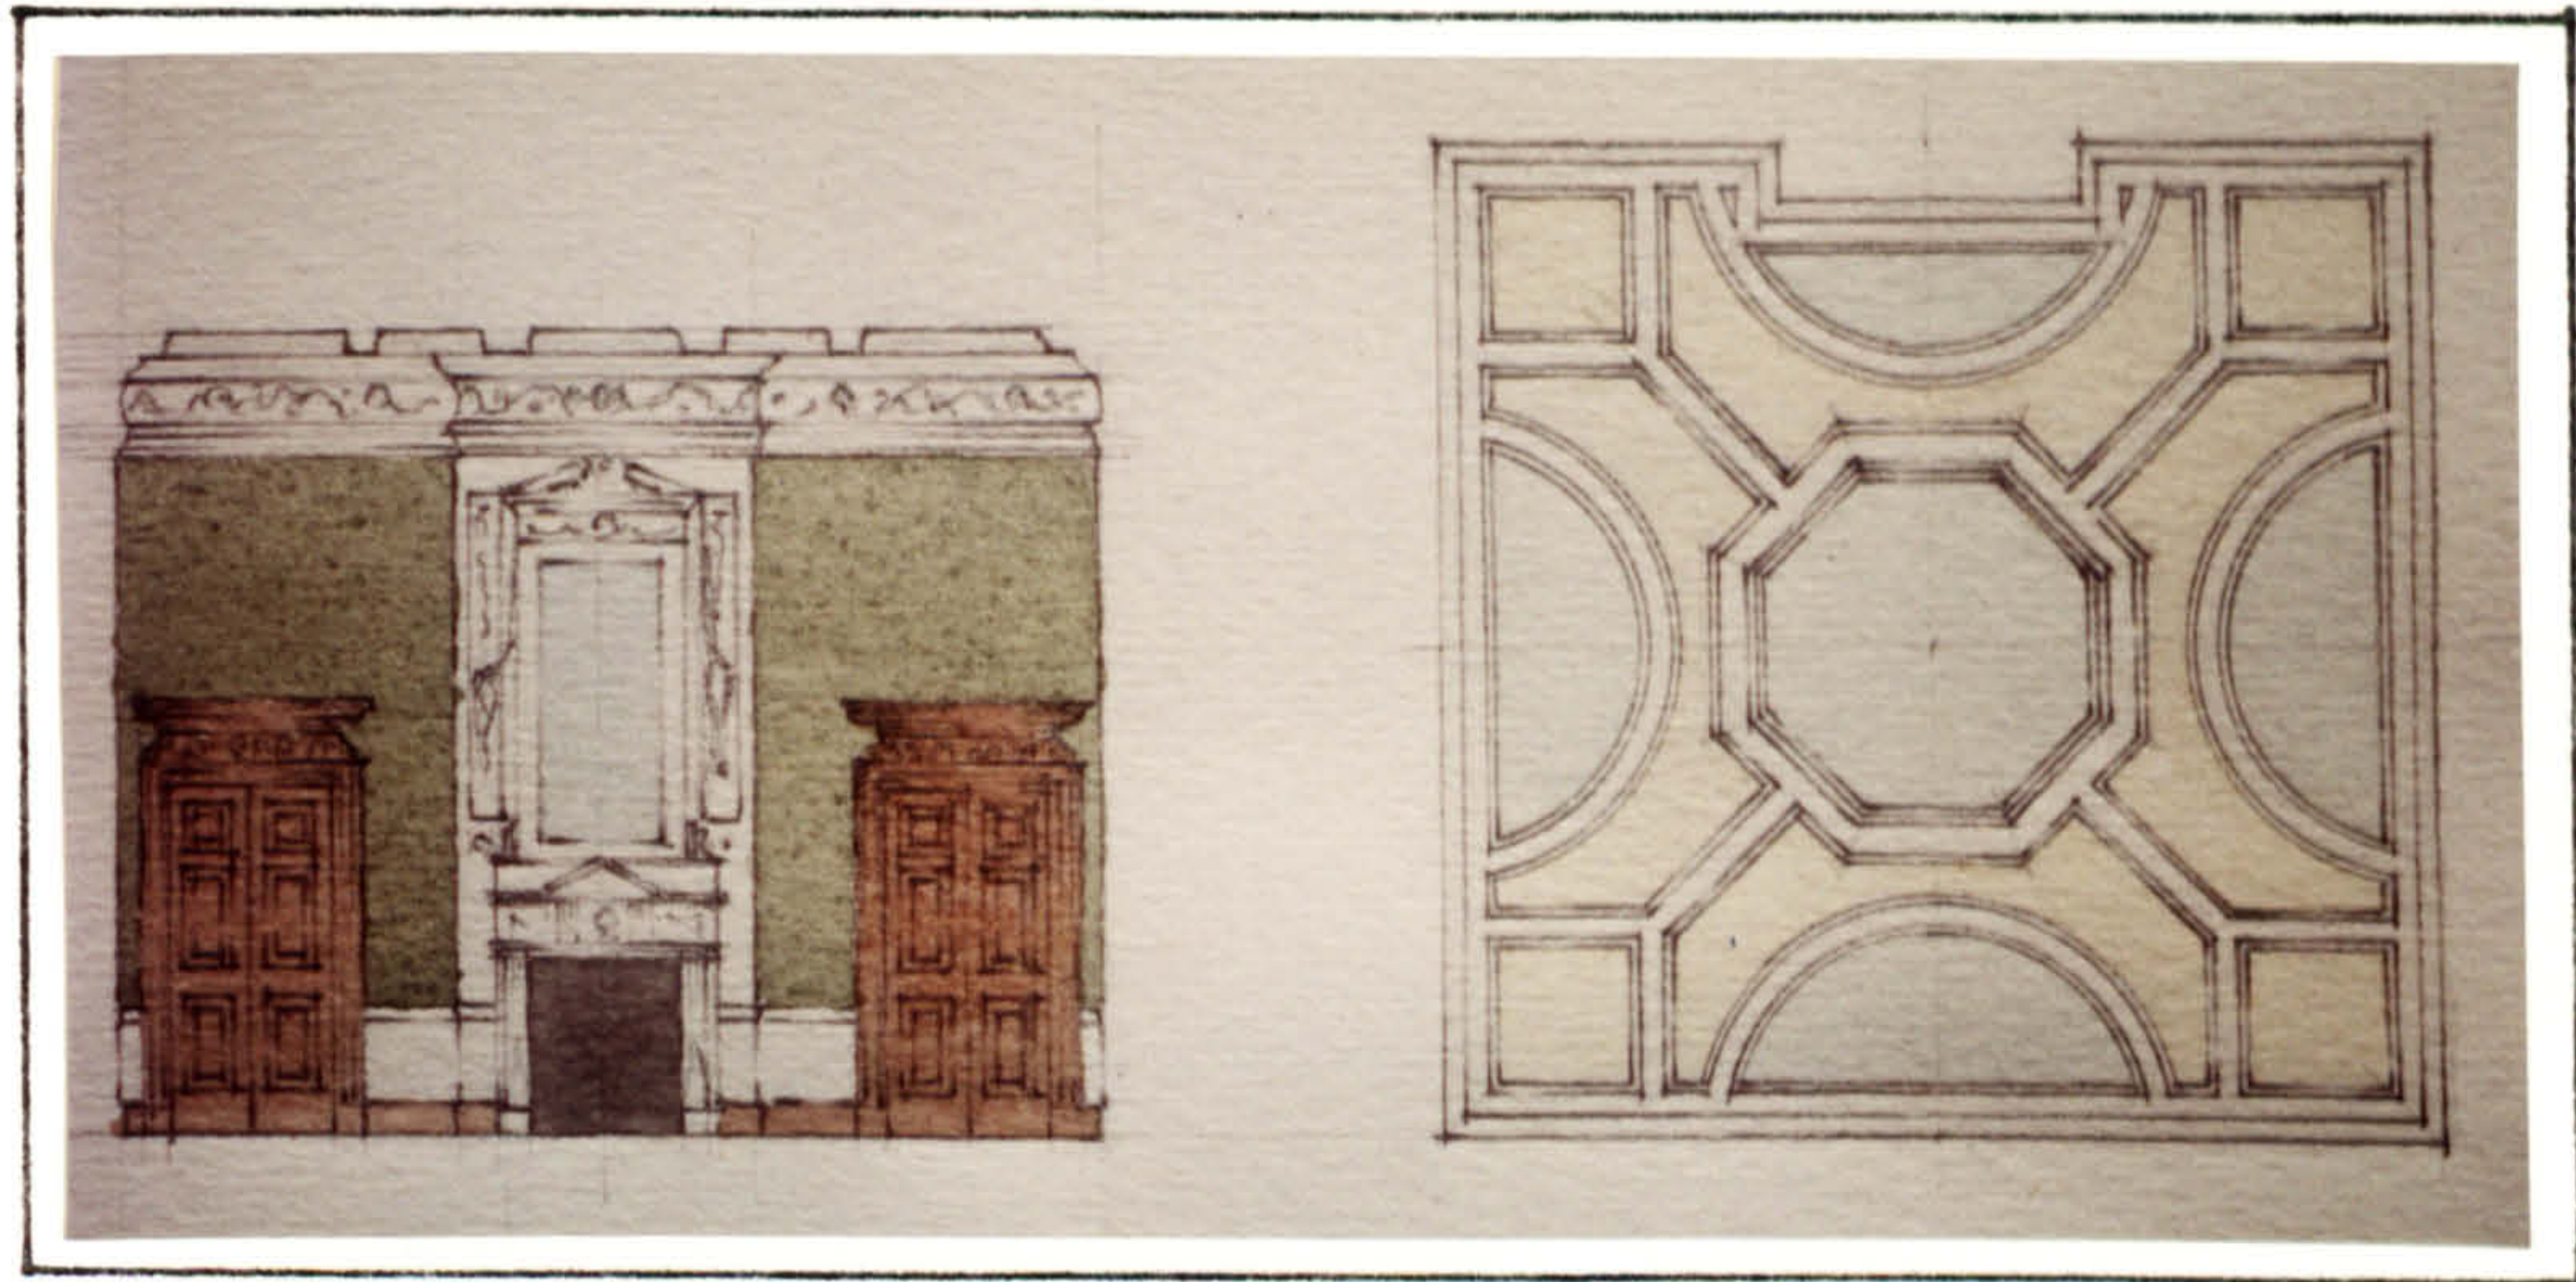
THE CABINET · HOUGHTON · ELEVATION SHOWING WALLS HUNG IN GREEN, AND CEILING PLAN SHOWING DISPOSITION OF TINTED GROUNDS TO COLOURED ARABESQUE
